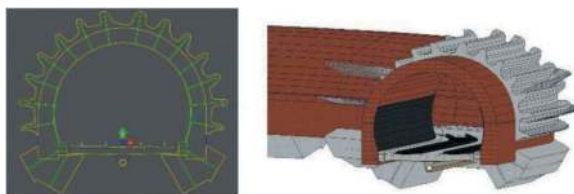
Proposed tunnel section (left) and proposed tunnel BIM model (right).
